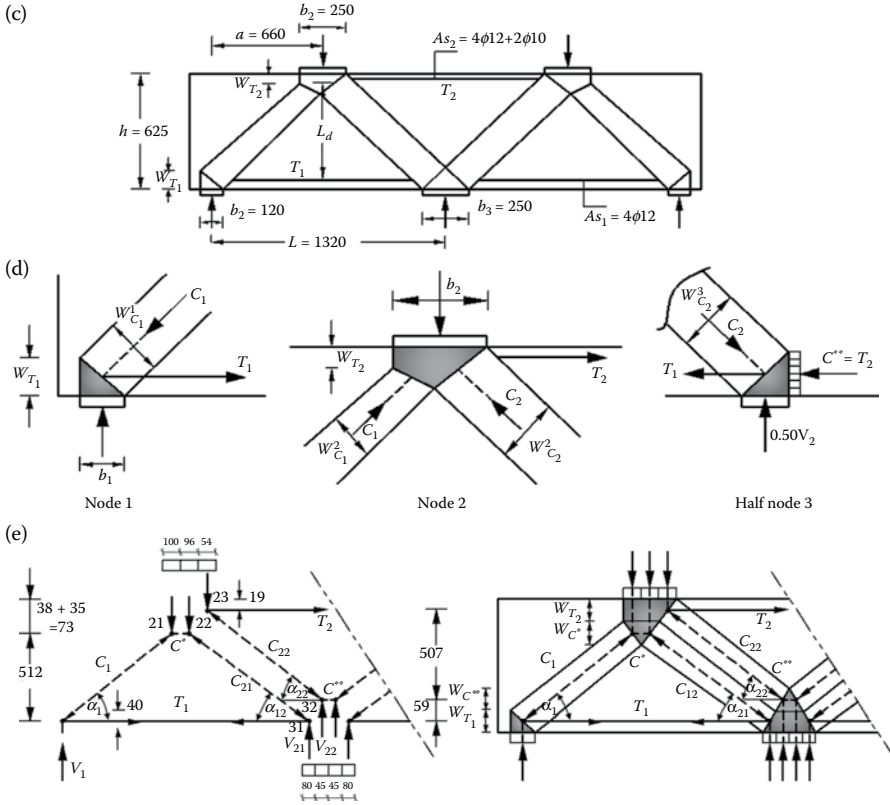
(Continued) Details of *STM* for top loaded continuous deep beam CDB1 subjected to a single point load: (c) details of the model, (d) details of nodes 1, 2, and half node 3, and (e) details of the detailed model.
